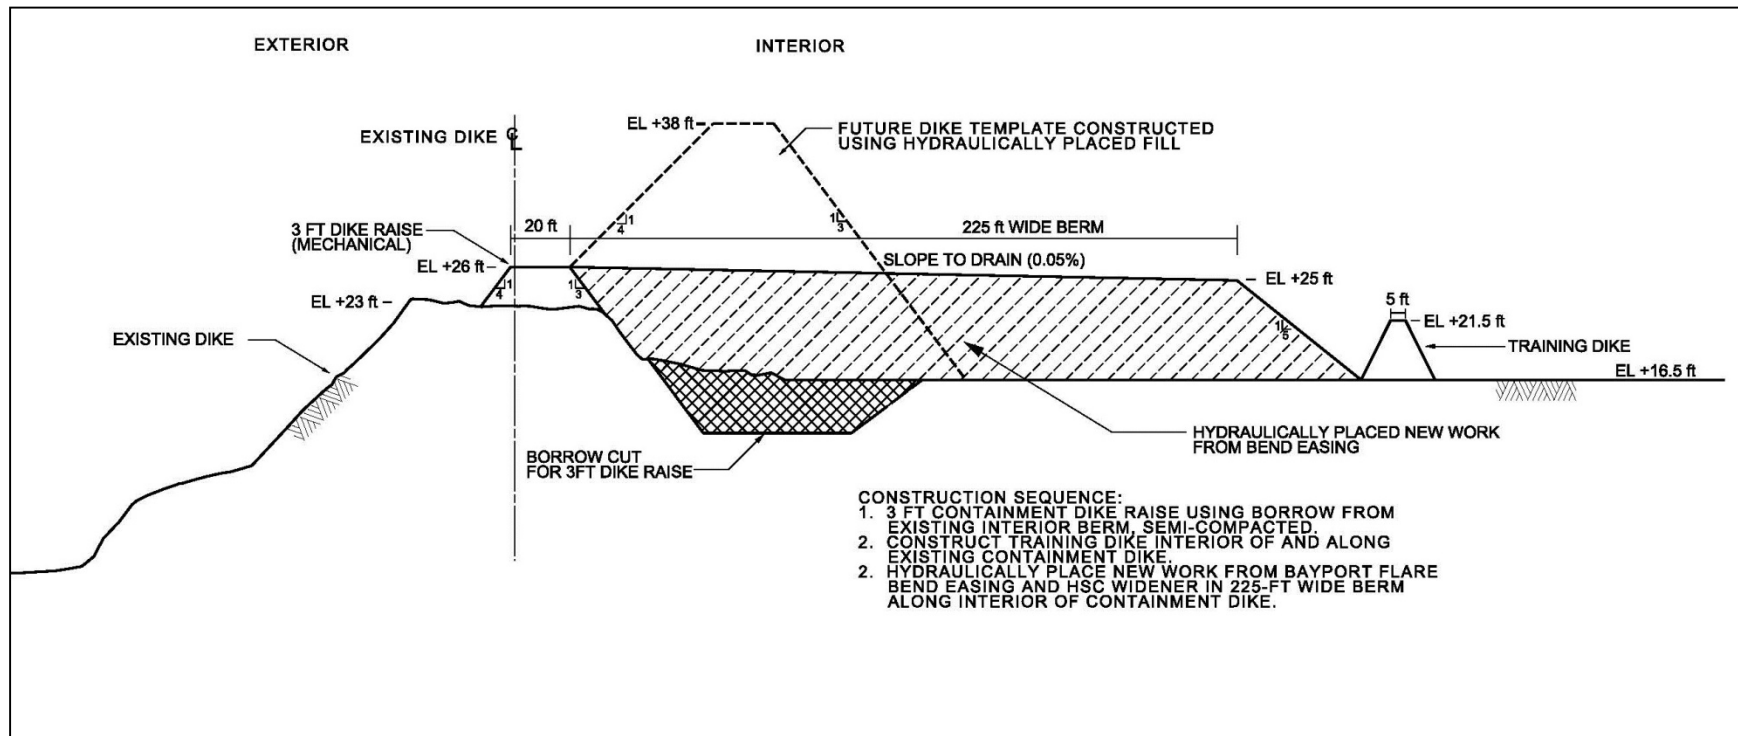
Typical Section Hydraulic Berm and Dike (not to scale)
